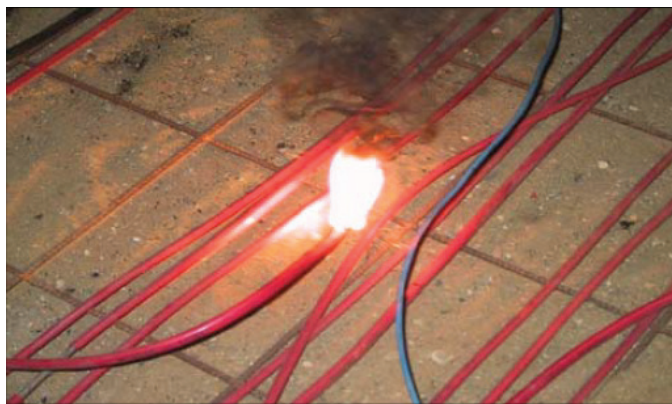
Photo of HVU-treated heating cable installed in open air on sand
